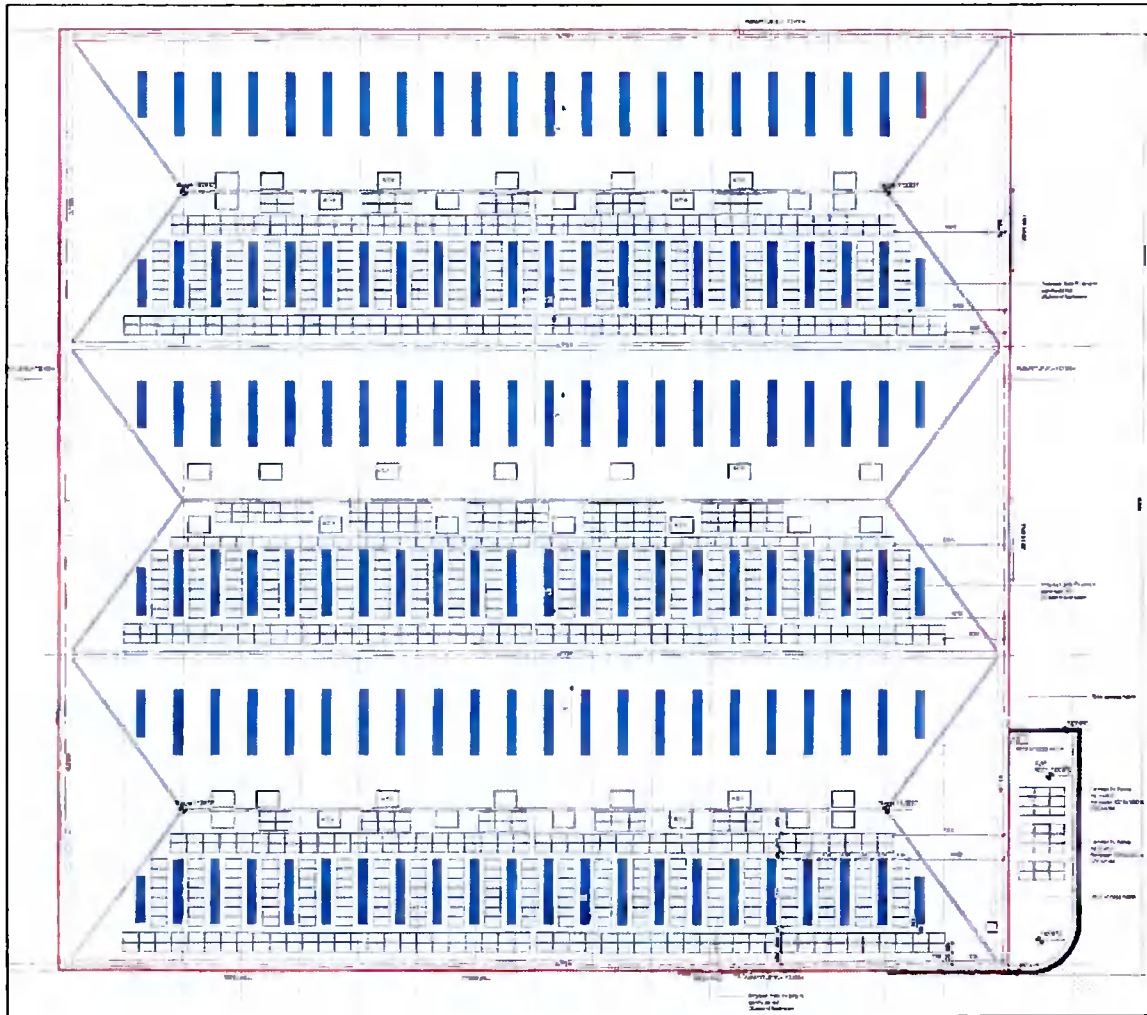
Proposed Roof Plan including Additional and Replacement PV Panels under SDCC Reg. Ref.: SD21A/0252 at Site G, Aerodrome Business Park
